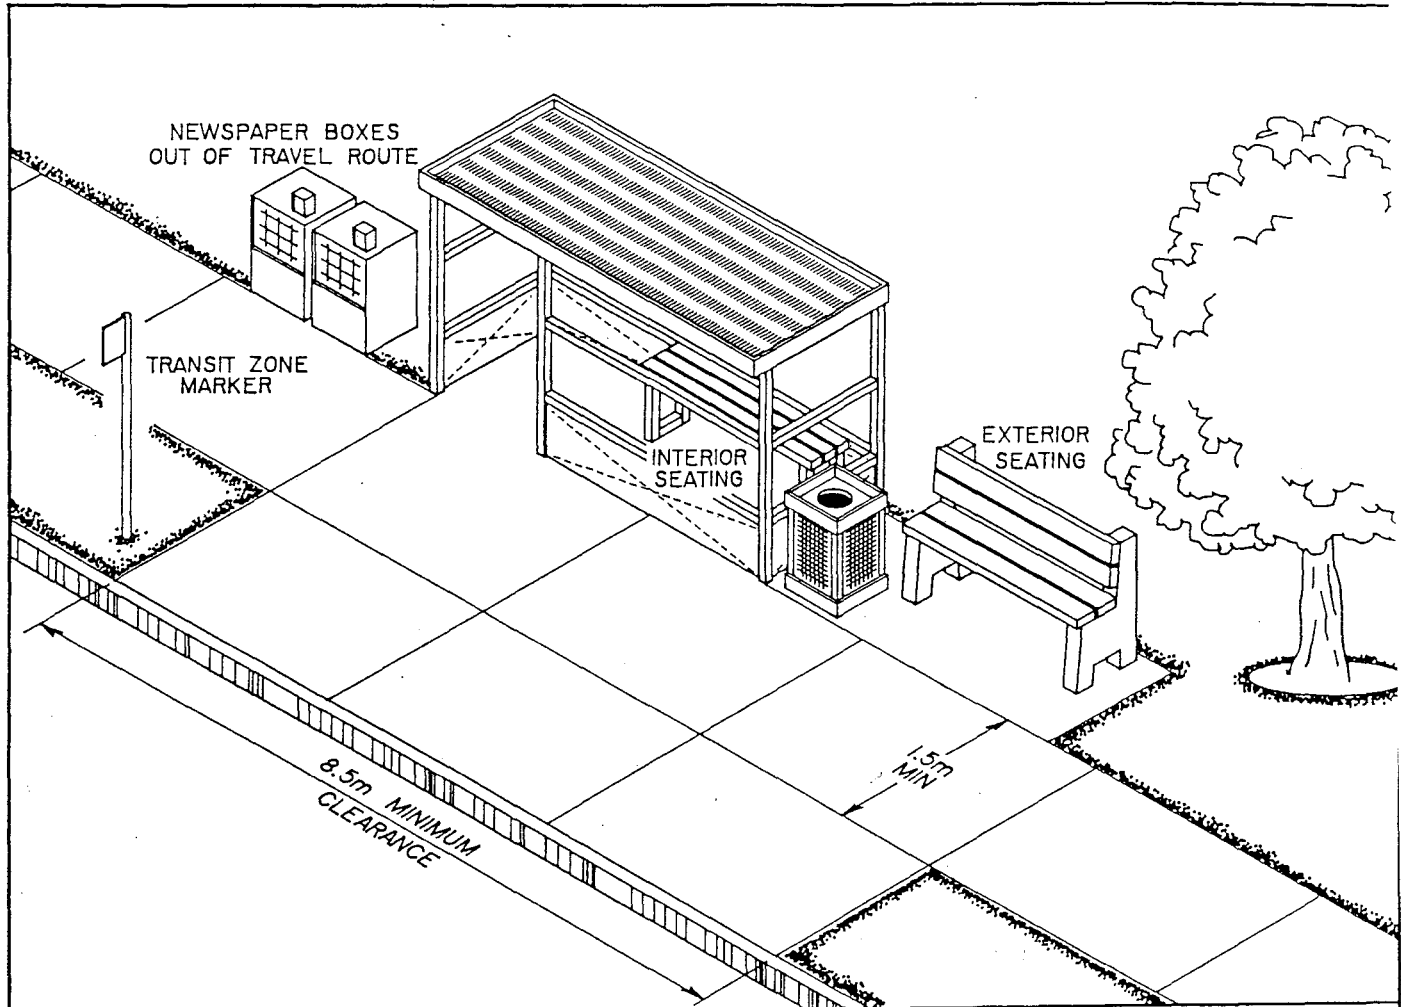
Transit Stop - Built-up, Monolithic Sidewalk
